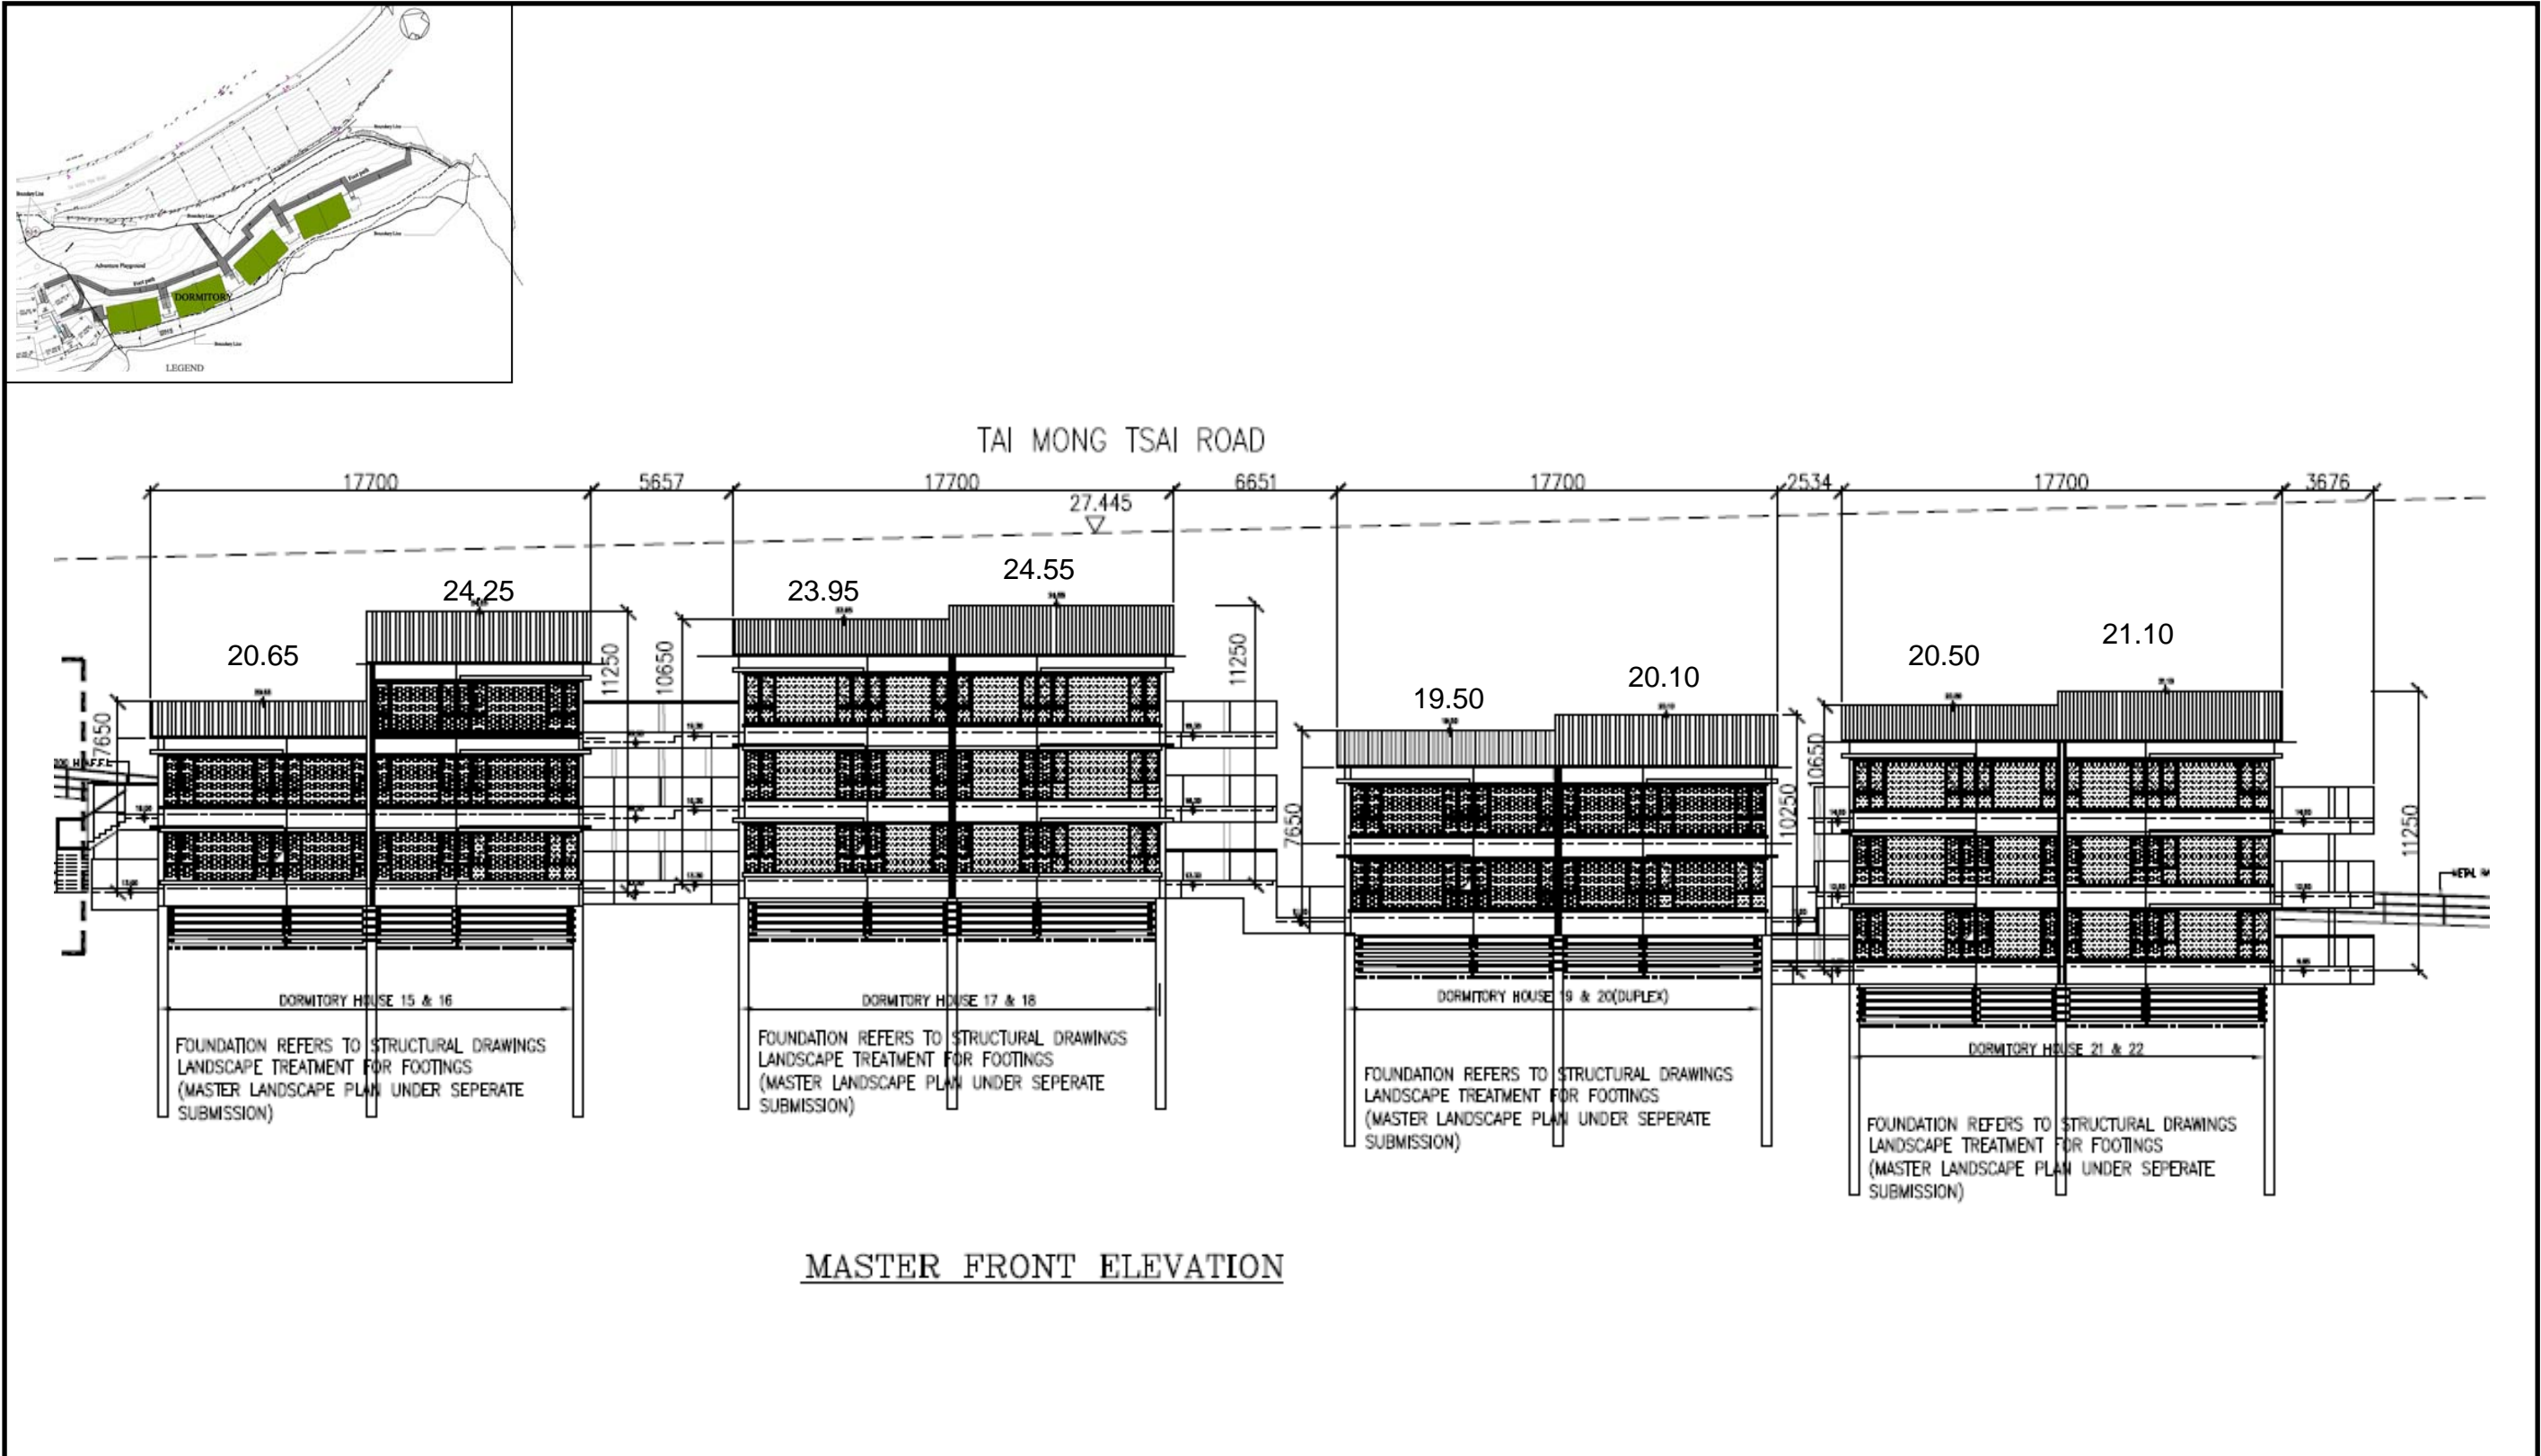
Front View of Proposed Dormitory, showing the Elevations (in m) and Dimension (in mm) of Each House and its Relation to Tai Mong Tsai Road
